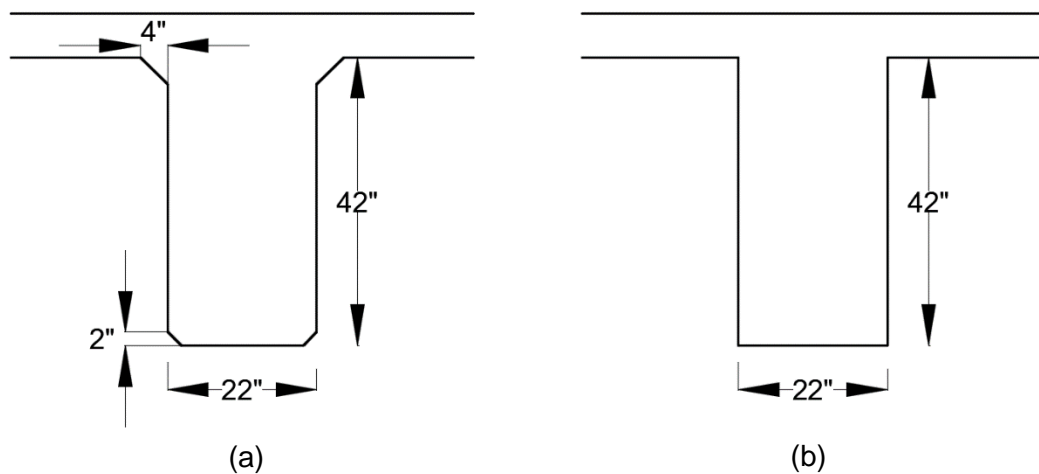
Typical Beam Cross Section (a) Actual (b) Simplified
